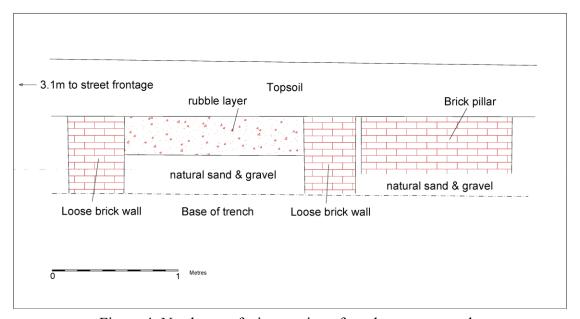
North-west facing section of north-eastern trench, showing wall sections observed
